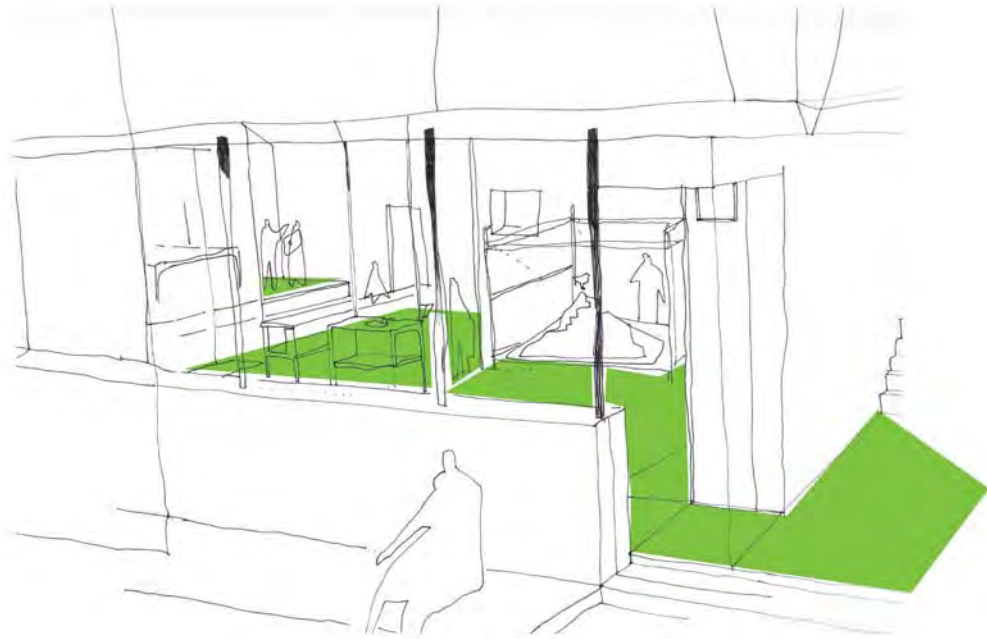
Perspective view into the maker space, connection onto elevation with the outdoor role theatre space. 168B Image of Ubuntu blocks as reference to plastic potential as flooring enclosing material.
